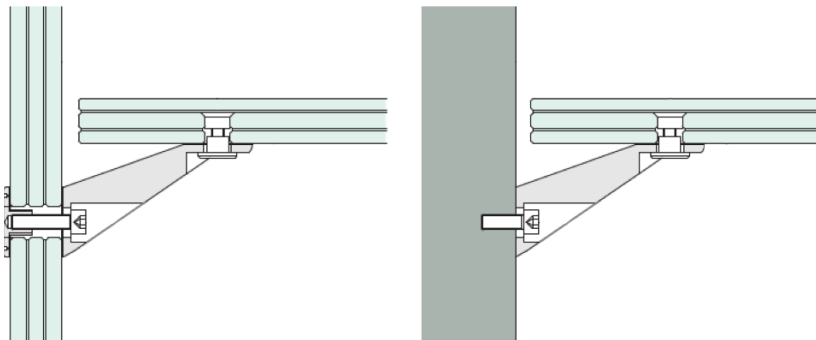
components for glass staircases in two configurations: stair joint to glass balustrade and stair joint to the wall
